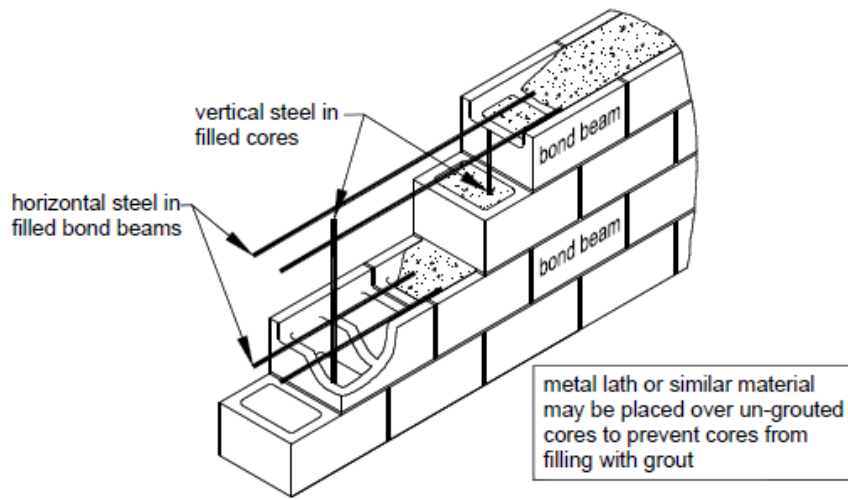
TYPICAL WALL REINFORCEMENT DETAIL
